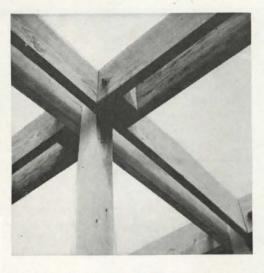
detail of connection at ceiling beams and column; approximately 500 split rings were used for similar connections. Photos: courtesy of Timber Engineering Co.
